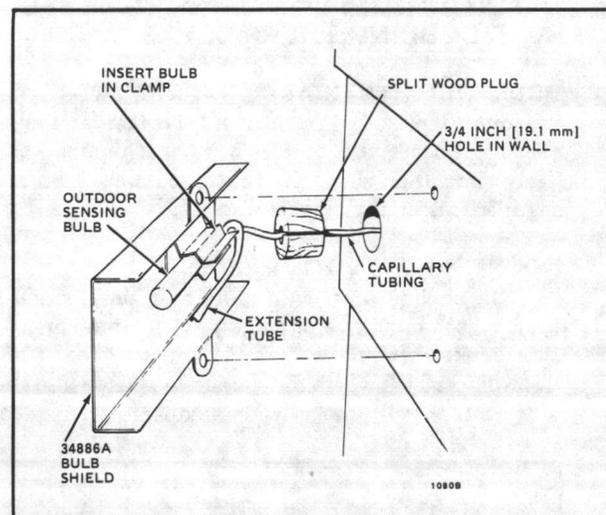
MOUNTING BULB IN SHIELD OUTSIDE BUILDING.
